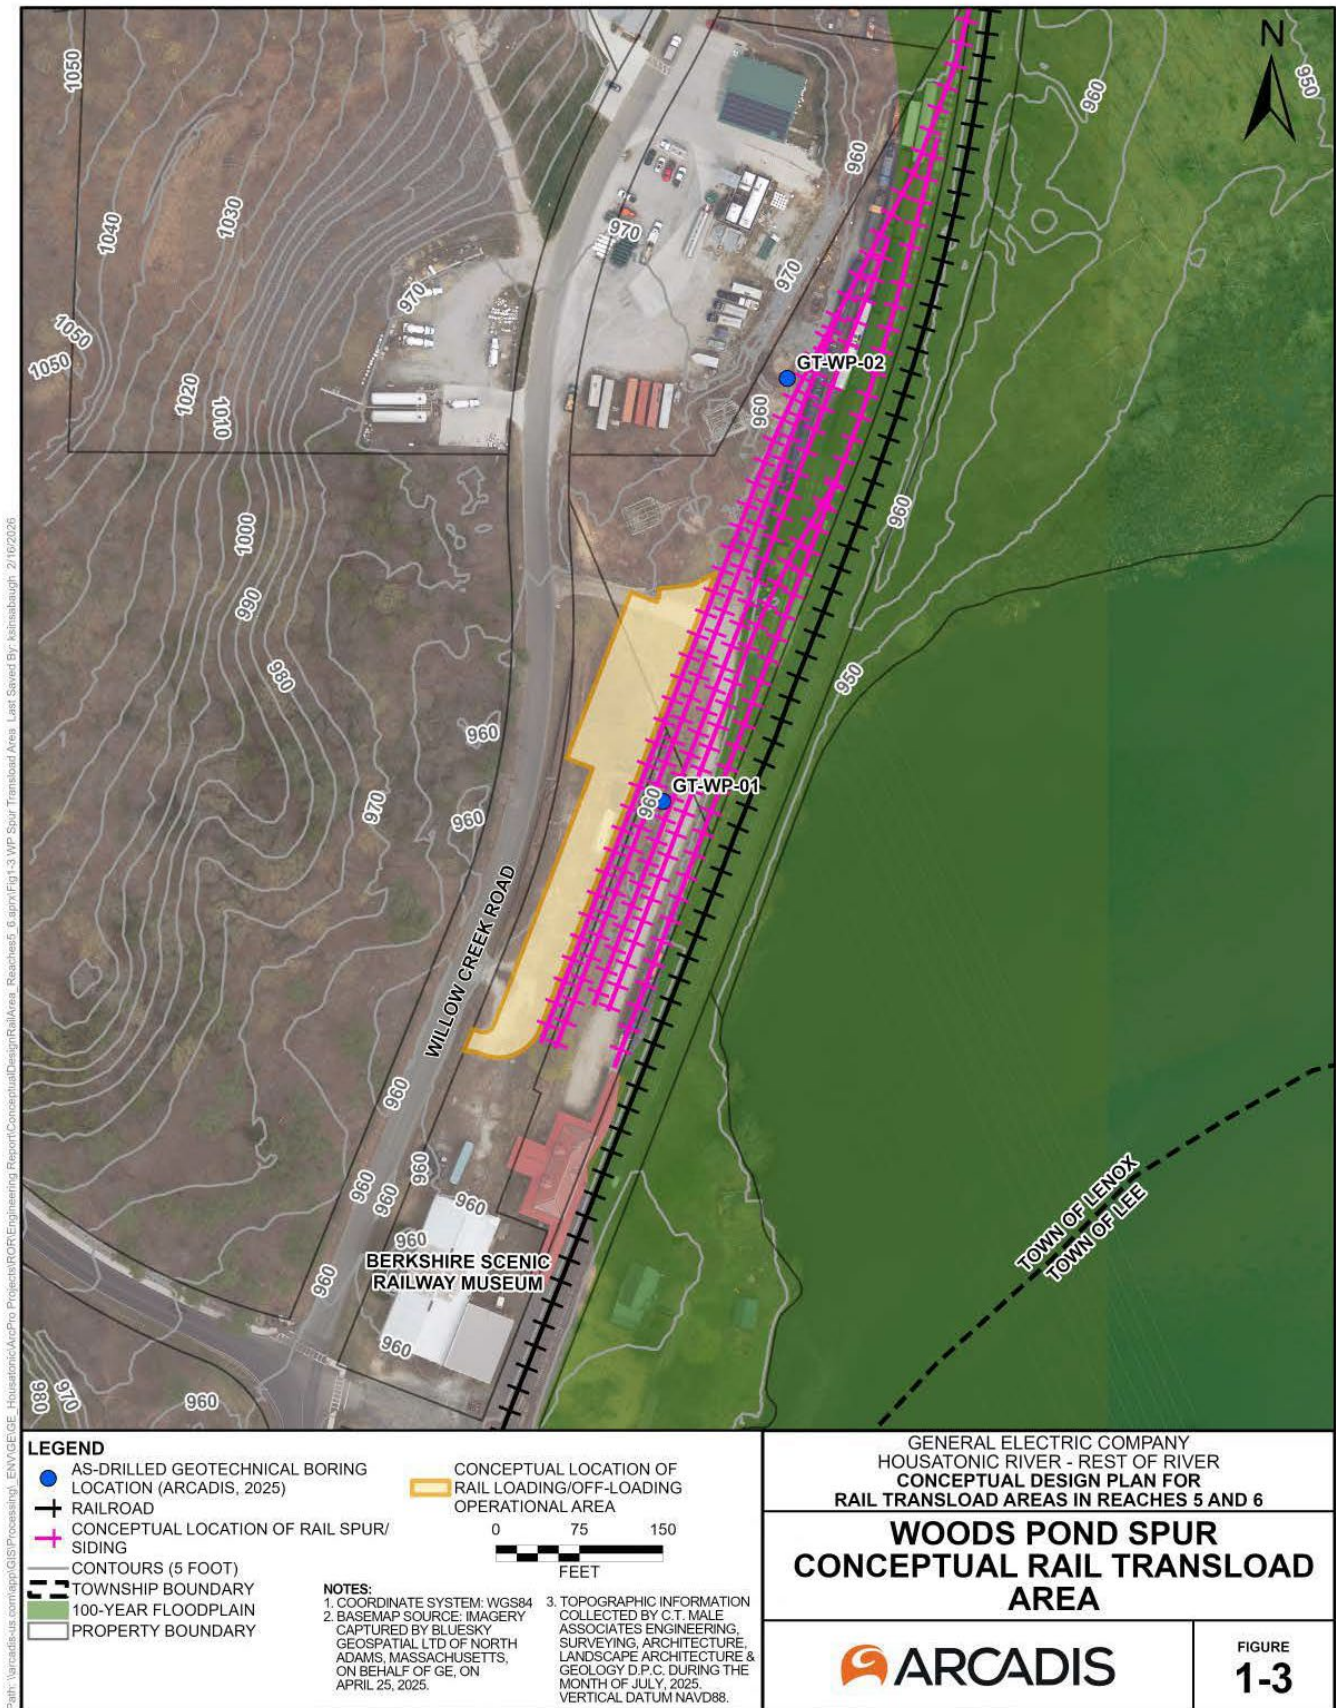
Conceptual Design for Woods Pond Spur Transload Area
